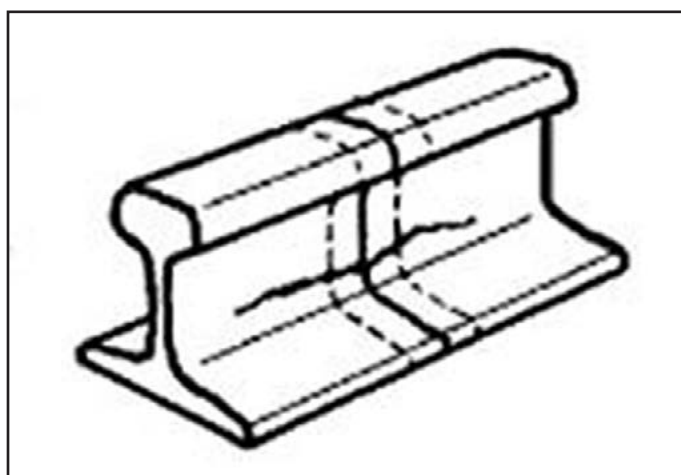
Schematically presented rail web crack in the welded joint area [13, 14]
